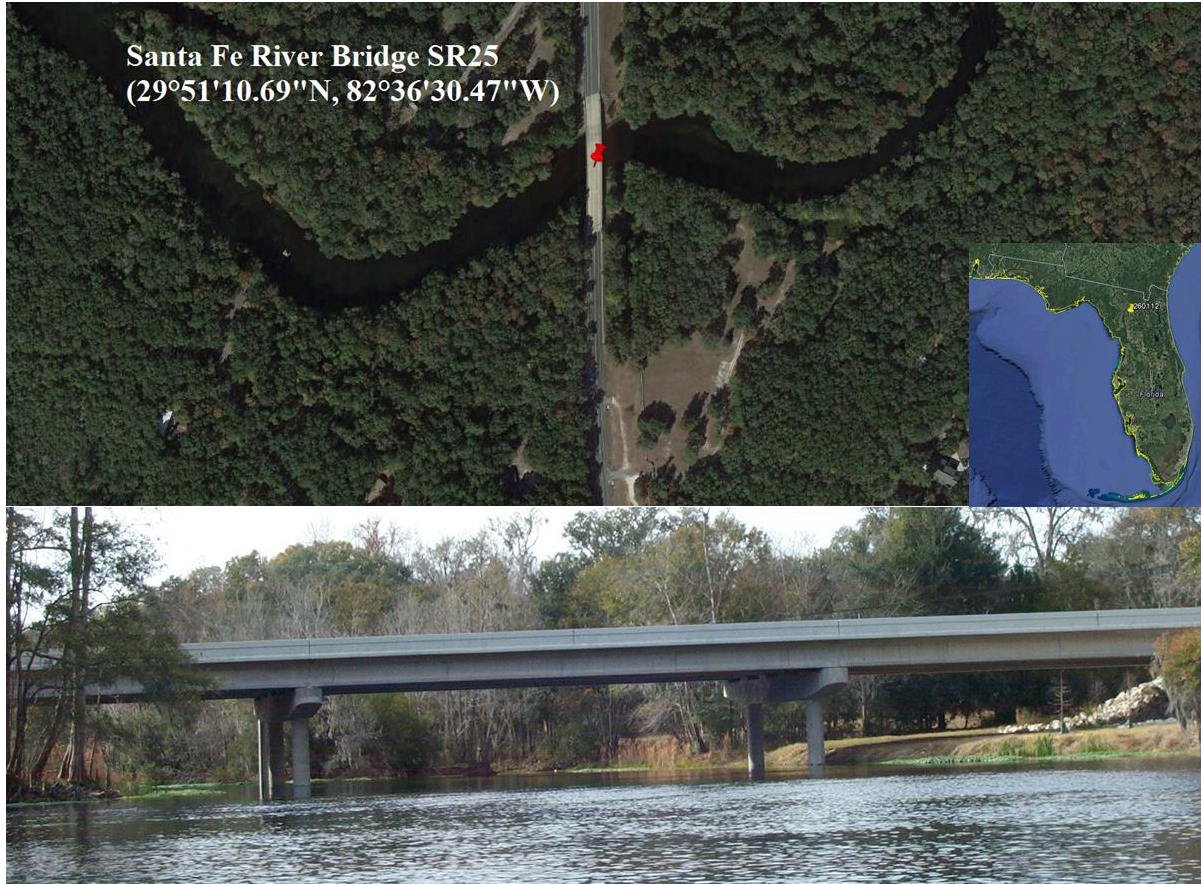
Bridge Number 260112 (Santa Fe River Bridge) plan and elevation images.
